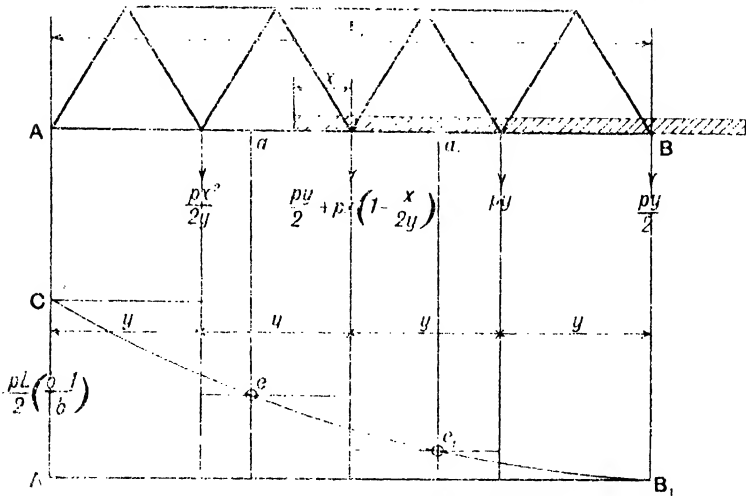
Stresses in Parallel-Flanged Girders with Uniform Rolling Load.
